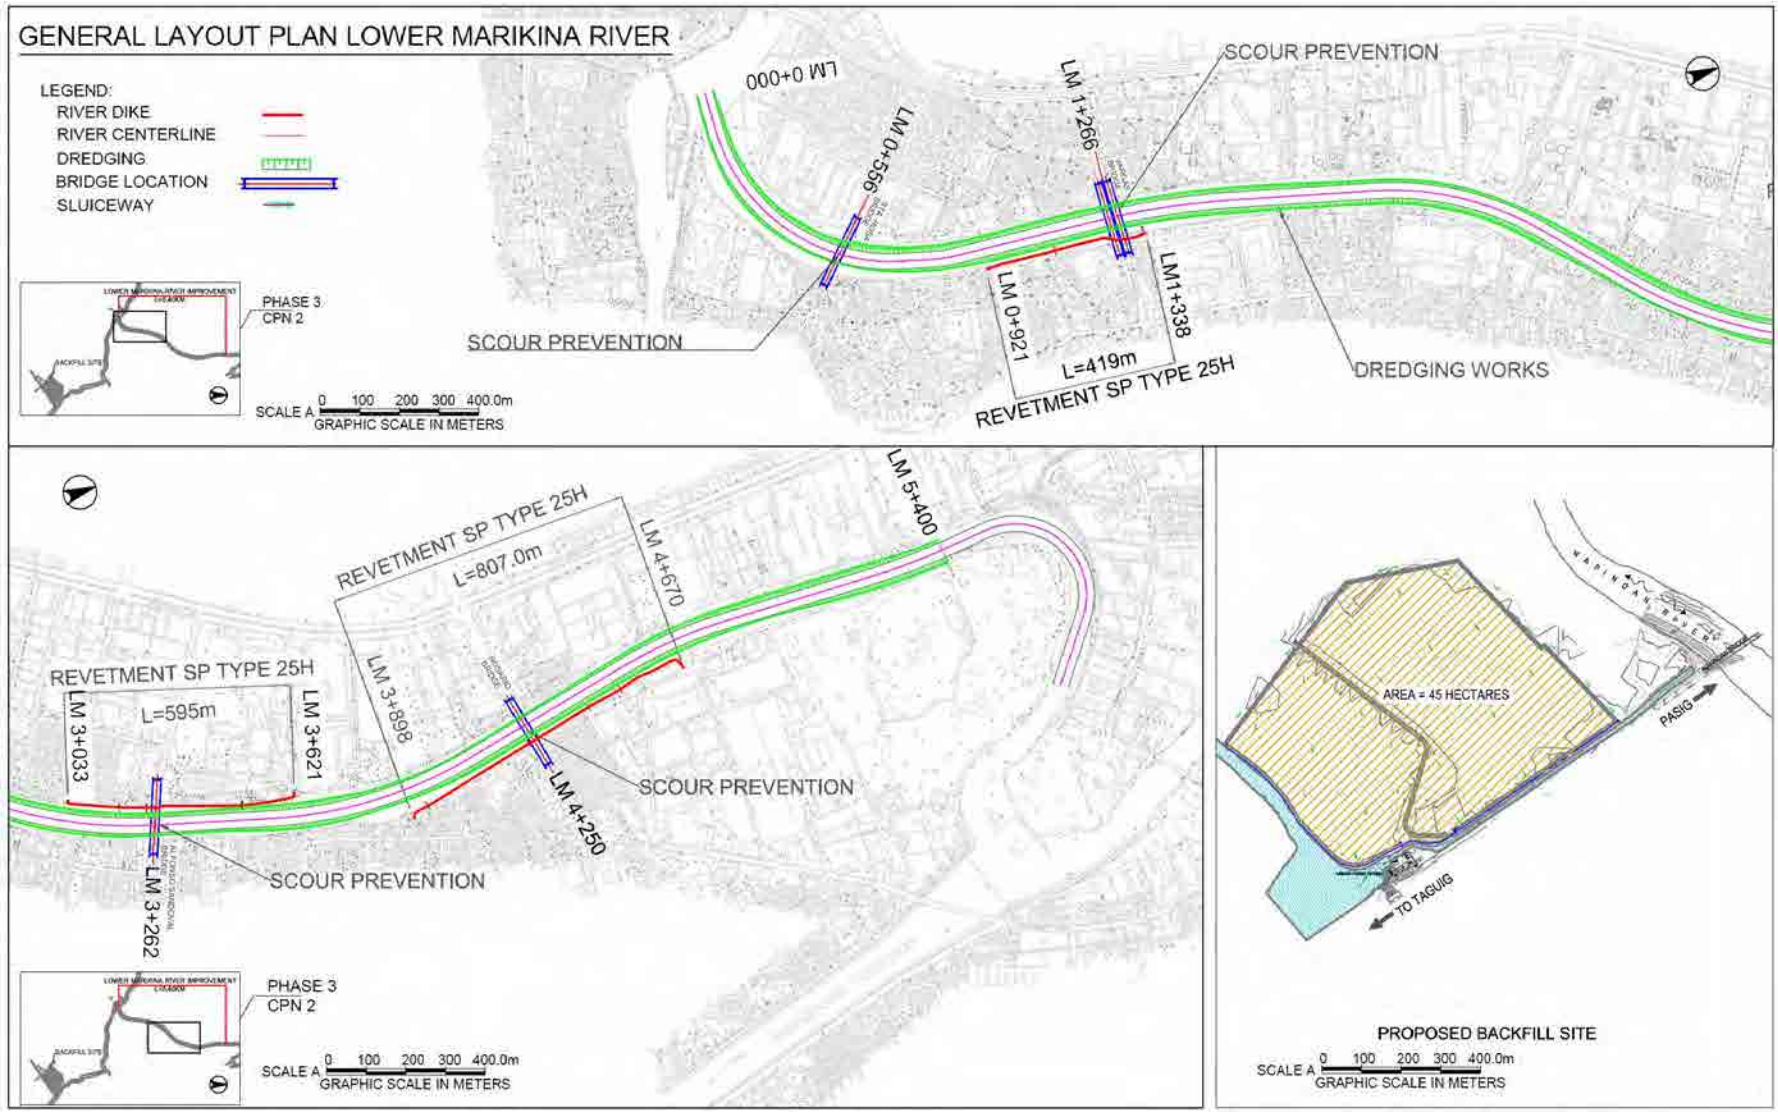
General Layout Plan(Lower Marikina River)
